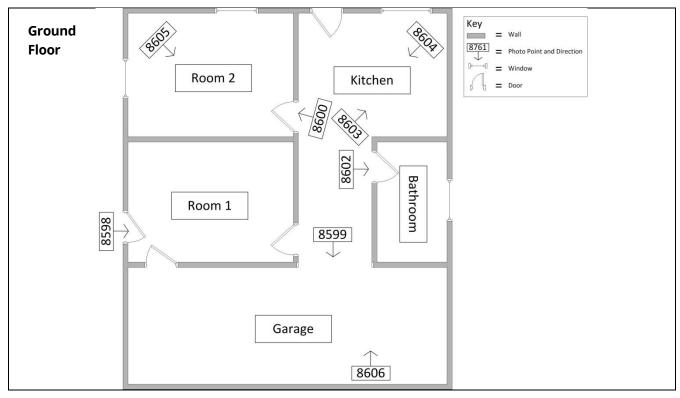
Interior photograph locations for CZB32: 2 Greaves Street.
